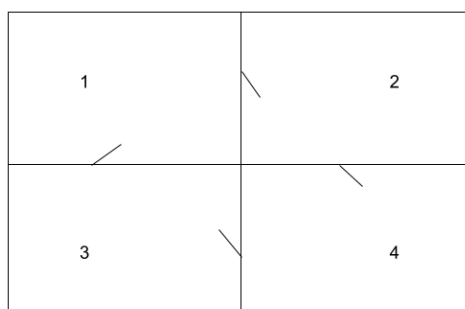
A possible floor plan of a building with four rooms, connected to each other by doors.
